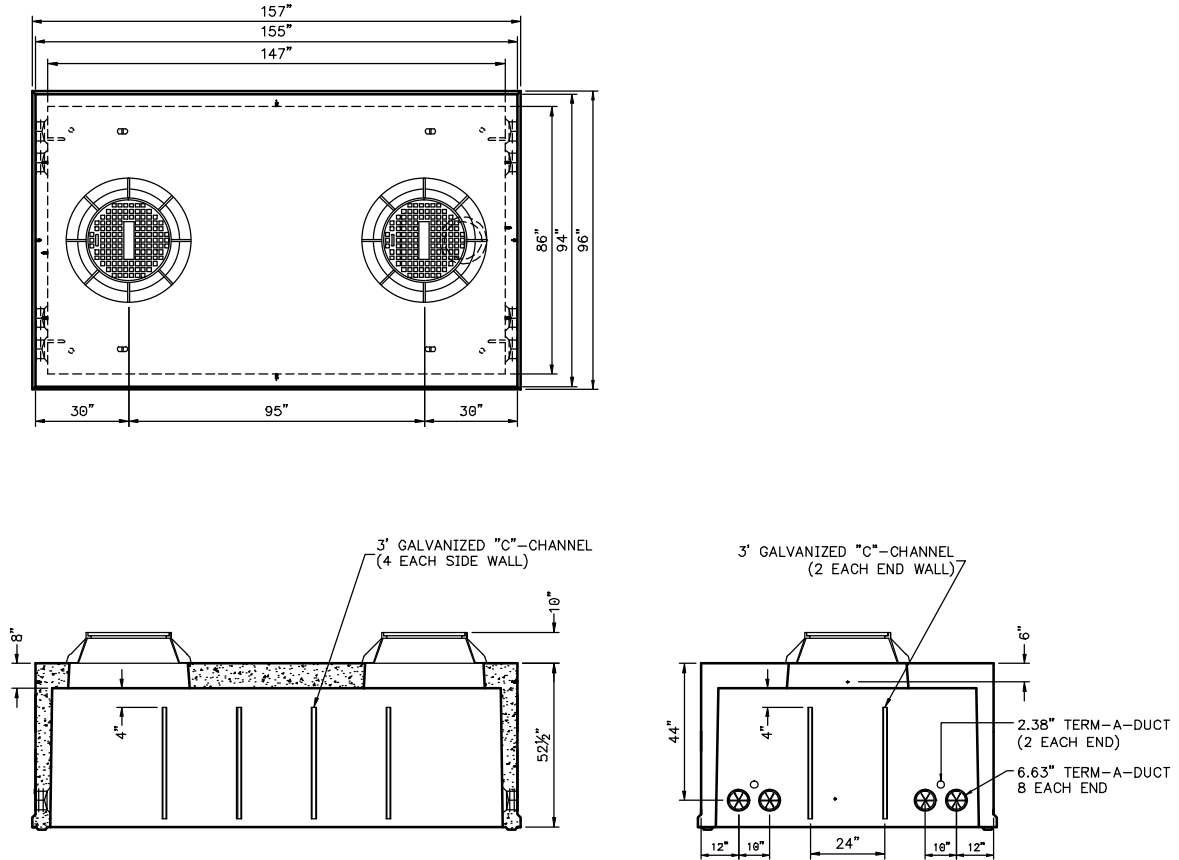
7' x 12' (94" x 155") Manhole Top Layout
